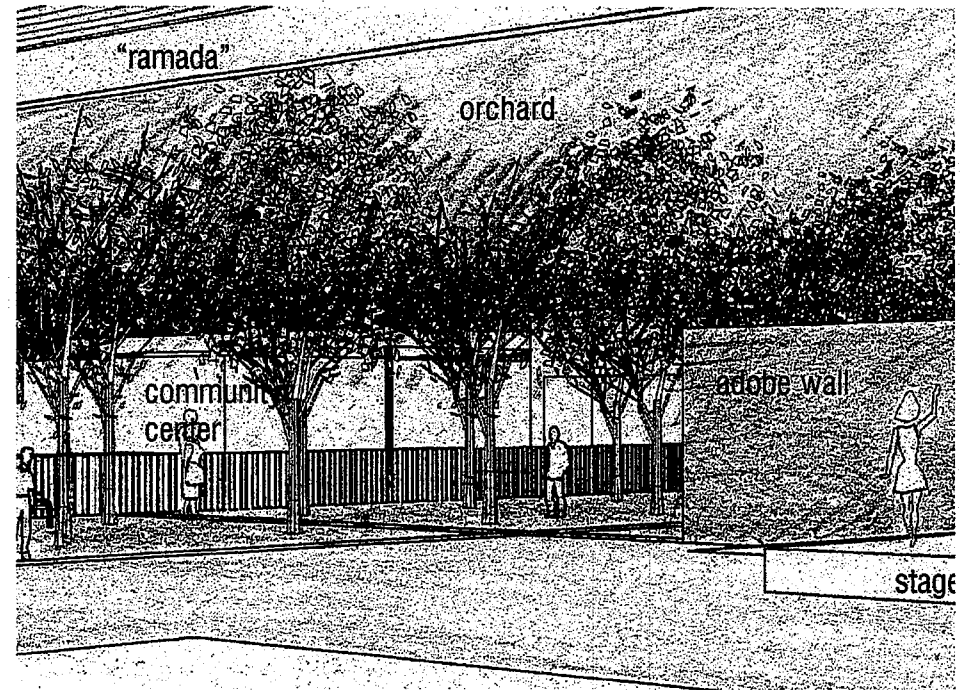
View of Stage and Adobe Wall from under "Ramada"
